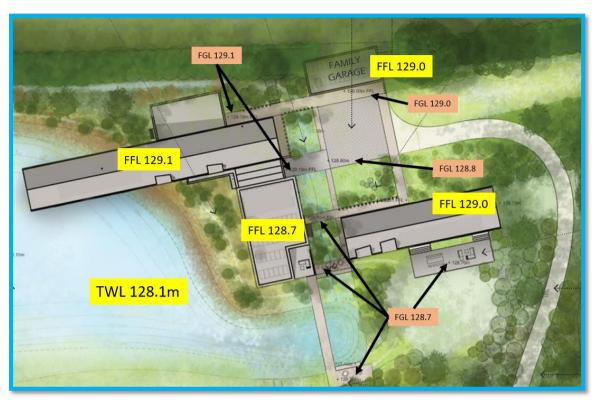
Proposed building layout with key proposed levels, showing the developed area more than 600mm above top water level (TWL).
